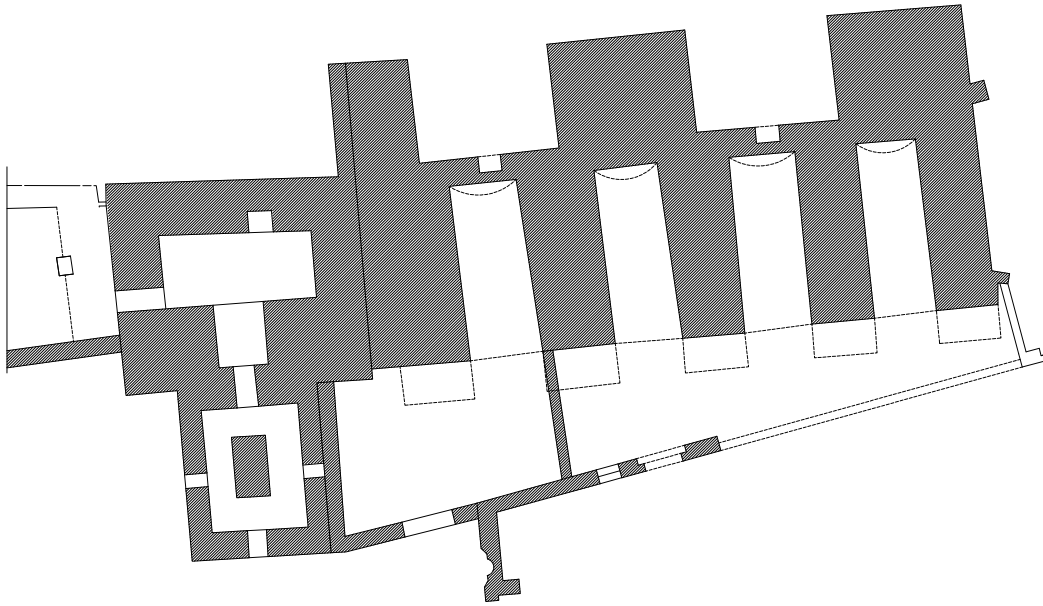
Plan of corbeled façade and Burg al-Rafrat (1:300)
